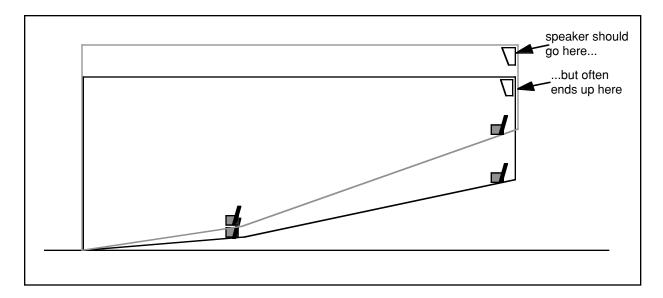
Typical slope seating area (bold line) and stadium-style slope (light line).
